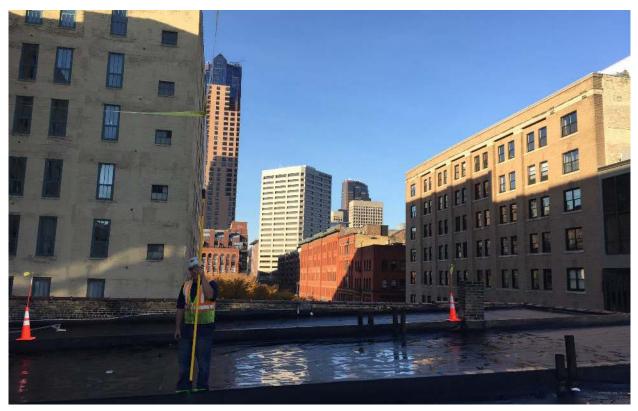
View of rooftop addition mock up, looking west. *Photo courtesy of Crowe Construction*.
